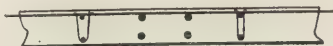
Section *cd* of Floor Slab (Fig. 288).
